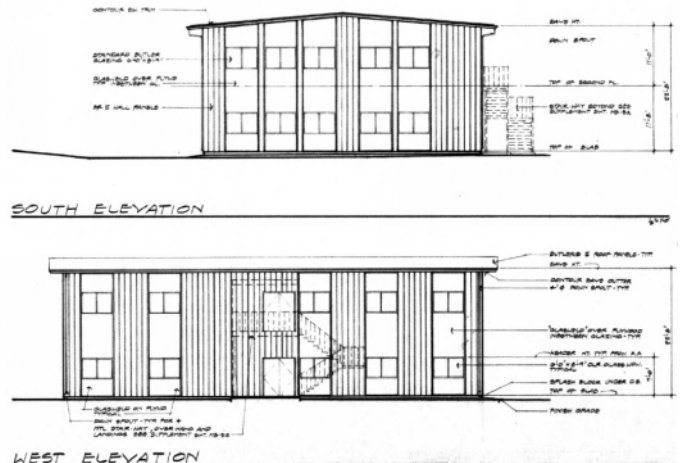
South[east] and [south]west elevations of 327 Bonair Siding Road, 1982. Prepared by Raiser Architectural Group. Source: Stanford LBRE.
